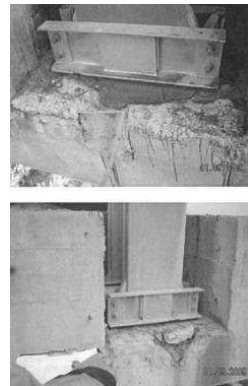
Pier M4 – General view and concrete damages at the base of the hold-down devices
